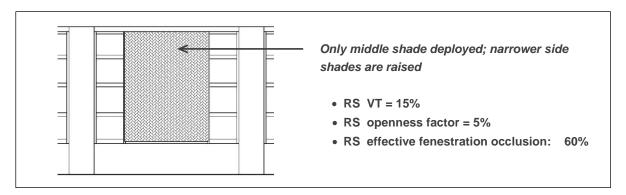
Interior elevation of typical bay showing case with lowered interior shading
